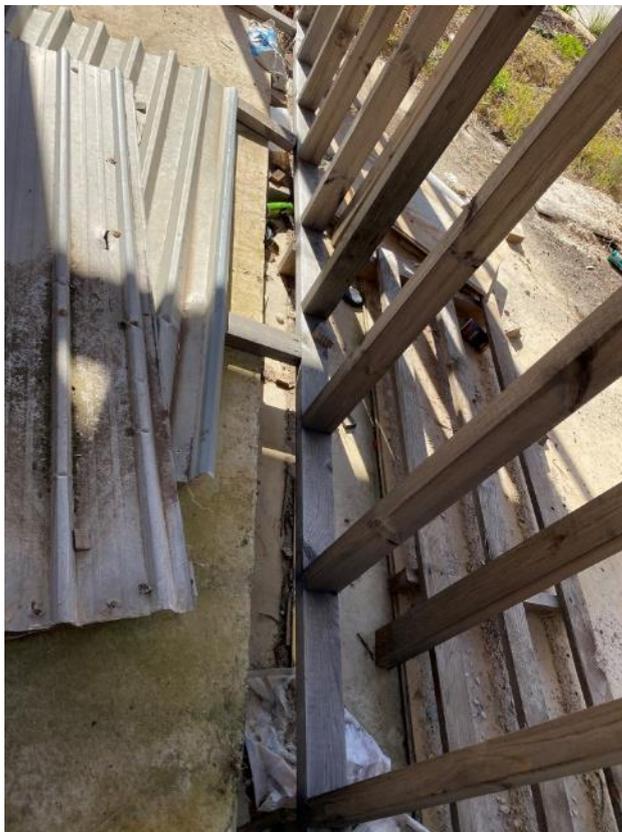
The timber frame to the garage wall has not been constructed on the rebate of the concrete slab.
